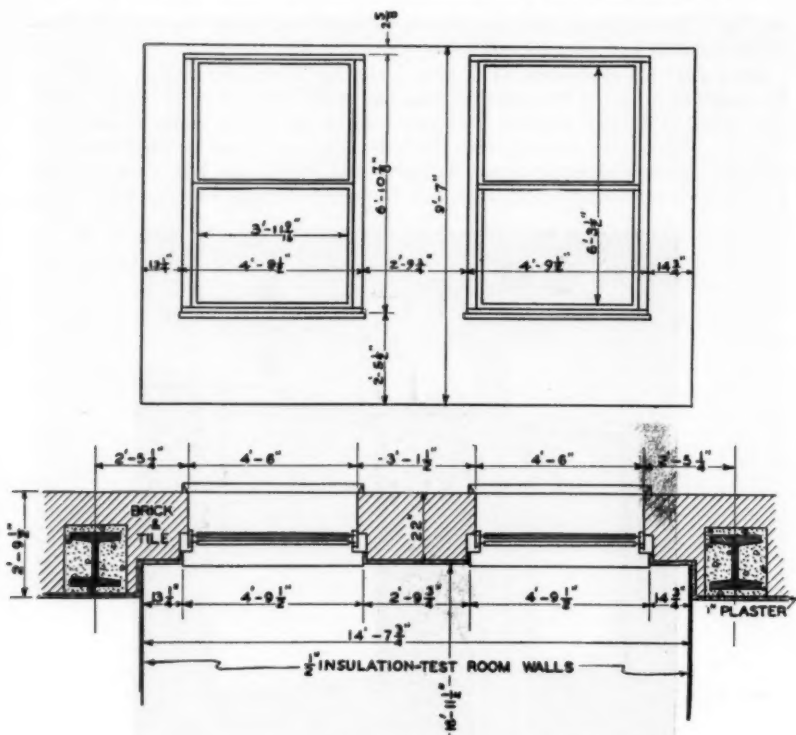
ELEVATION AND SECTION OF WALL, WEST TEST ROOM
